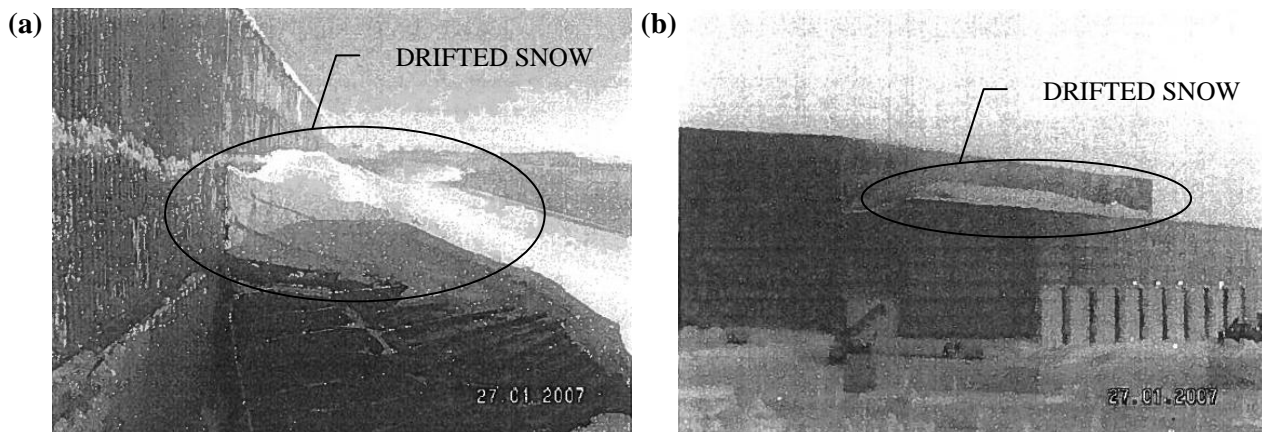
(a) Drifted snow profile and (b) roof profile at location of failure (J.R. Harris & Co. 2011).
